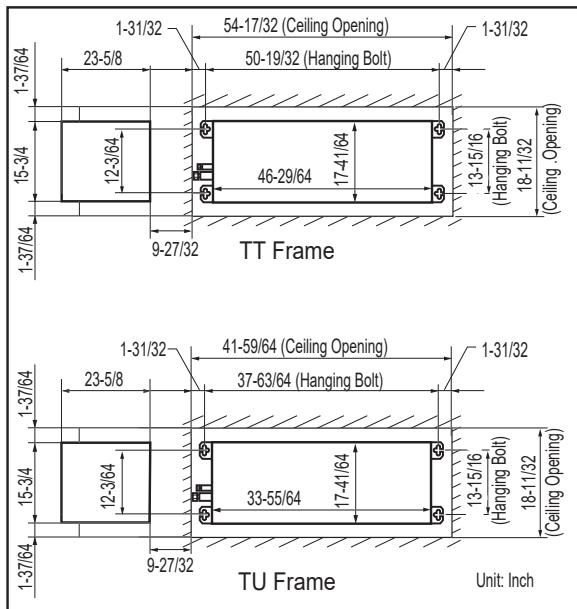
Ceiling Opening / Hanging Bolt Locations for Two-Way Ceiling Cassette Indoor Units.
